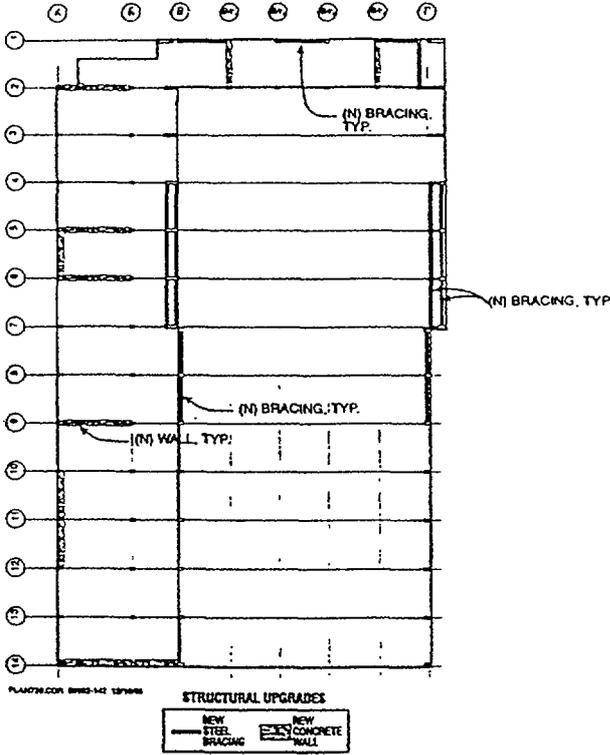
Plan of Structural Upgrades at Elevation 7.2m
